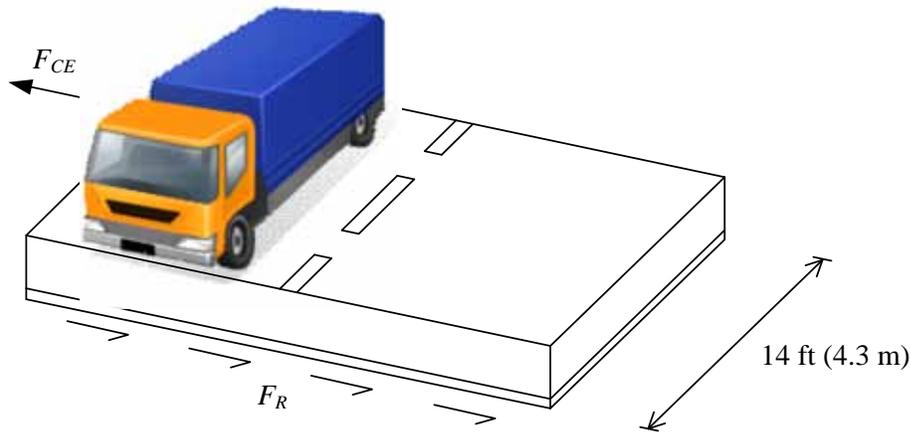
Pavement block used to determine $W_{Pavement}$ in Eq. D.4.
